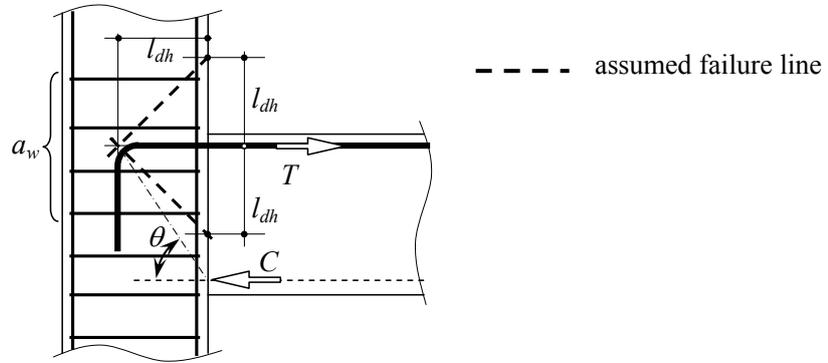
Calculate Model of Raking-out Anchorage Failure (Joh et. al)
